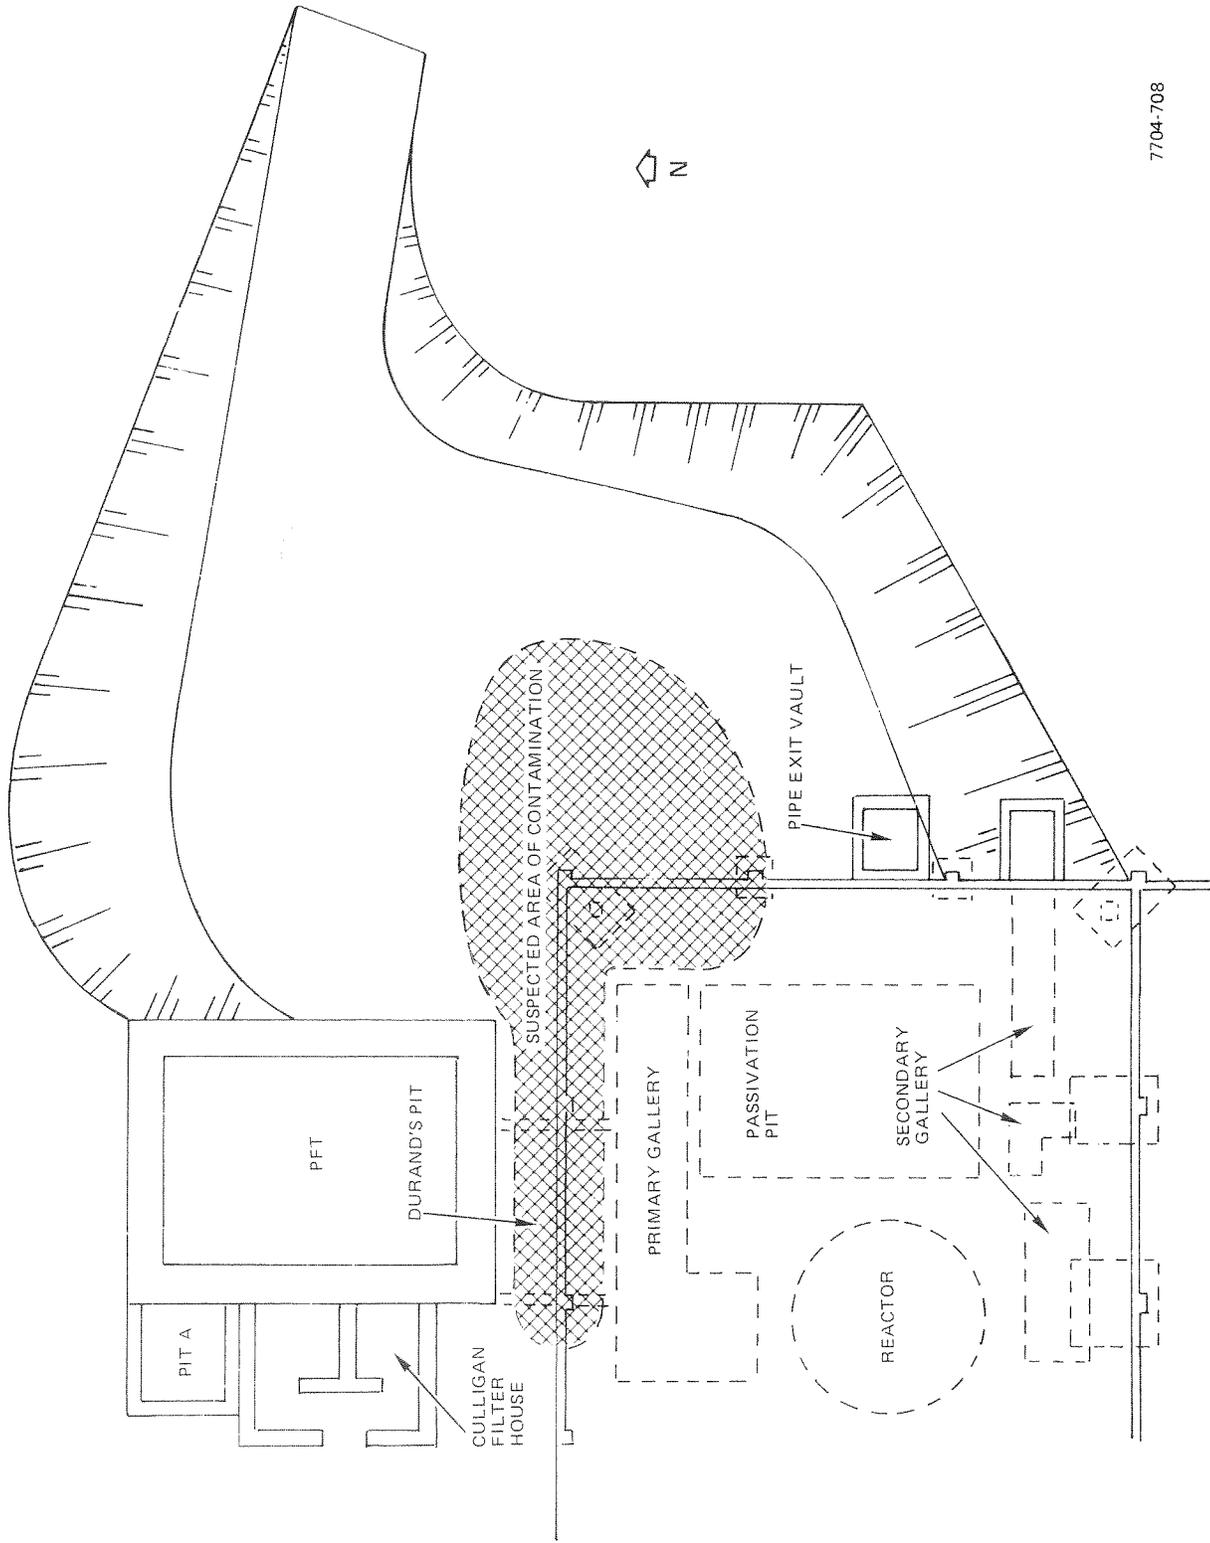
Initial Excavation at Northeast Corner of the SRE High Bay
